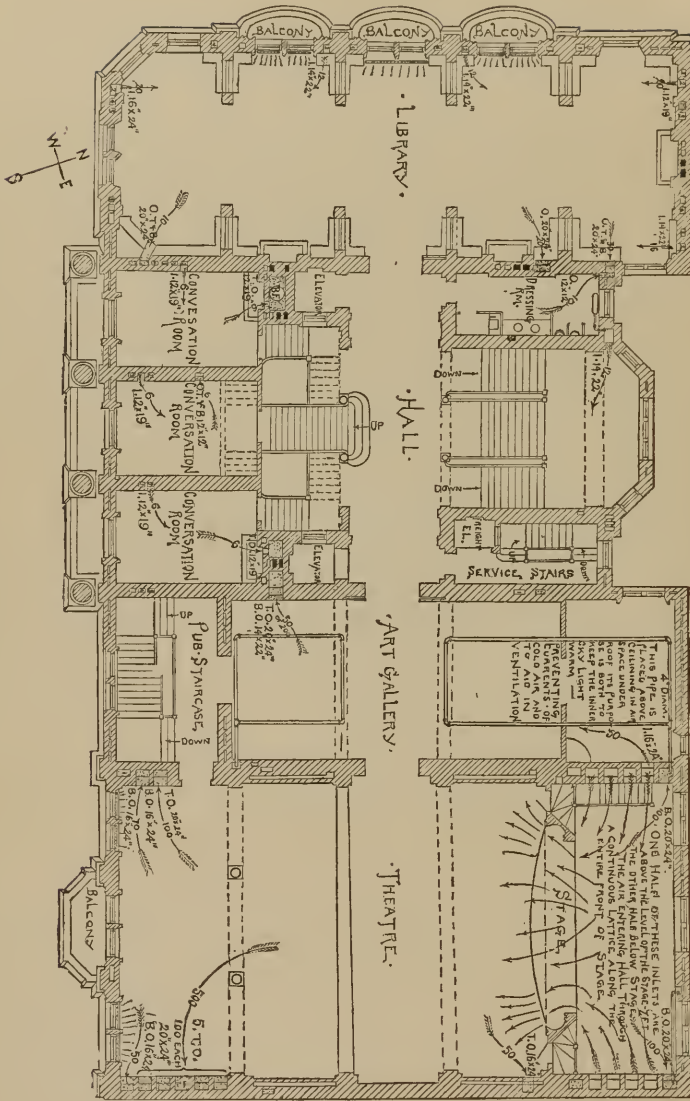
SECOND FLOOR PLAN, UNION LEAGUE CLUB,
